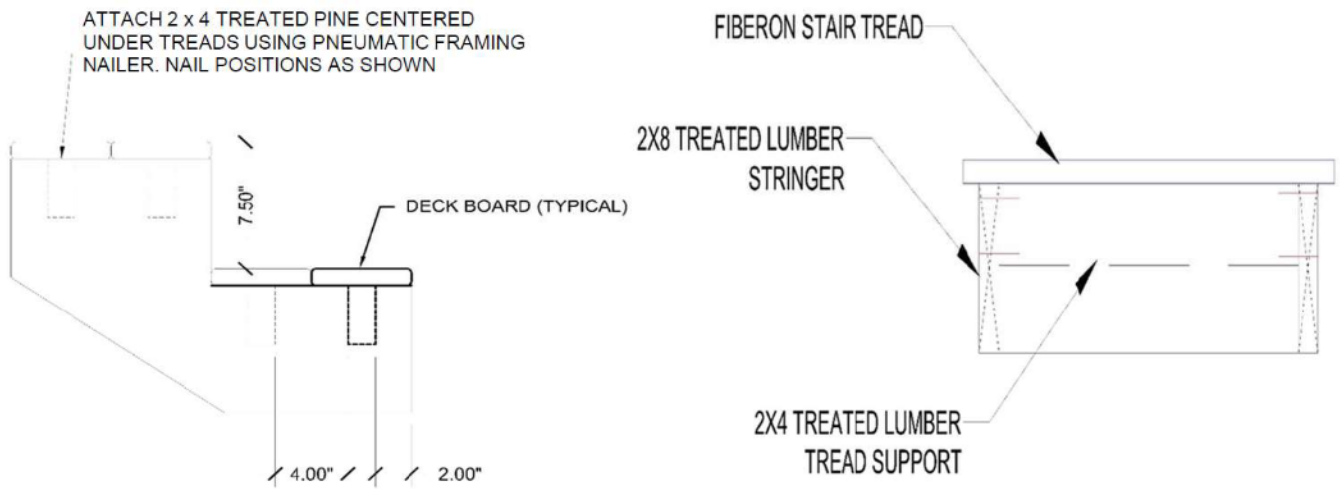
FIBERON® PARAMOUNT® AND PROMENADE STAIR TREAD INSTALLATION
